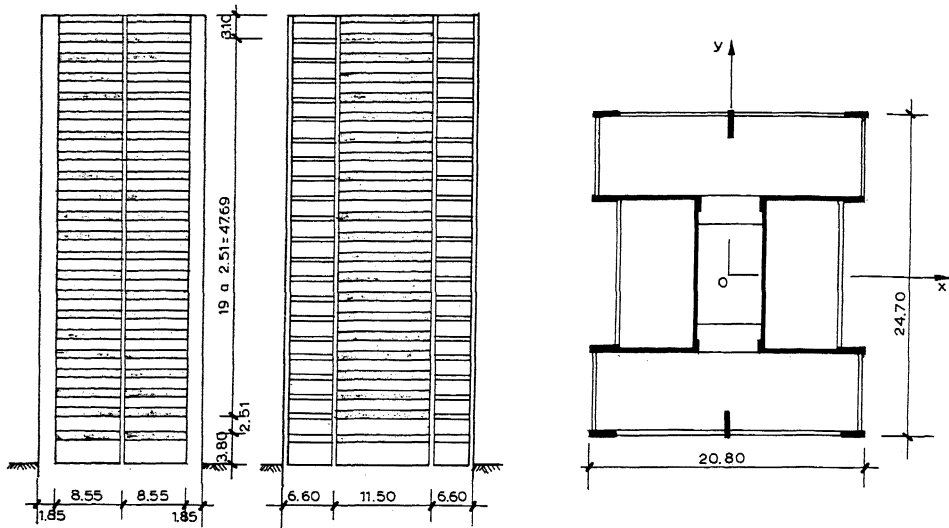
BUILDING N°2 PLAN AND ELEVATIONS
